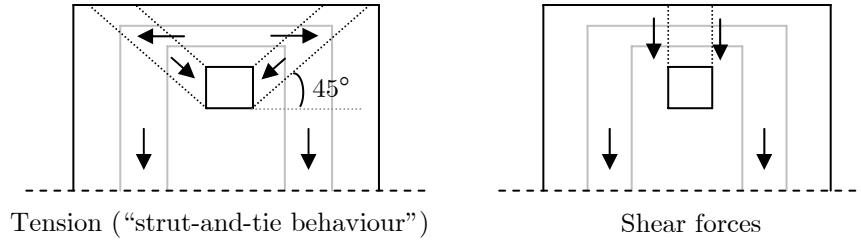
Forces acting along the shear cracks in the slab
